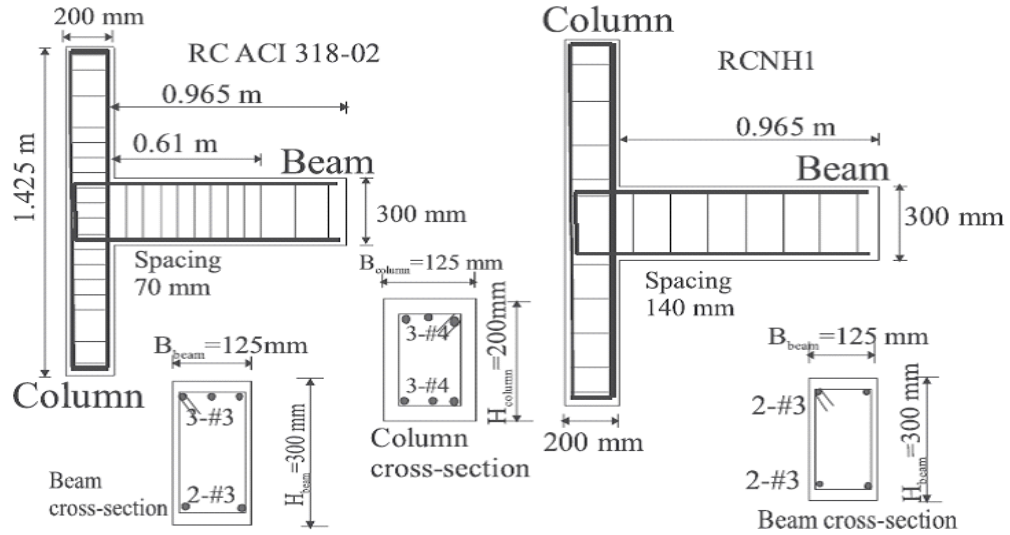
Geometry and reinforcement detailing for exterior BCJ Specimens [22]
